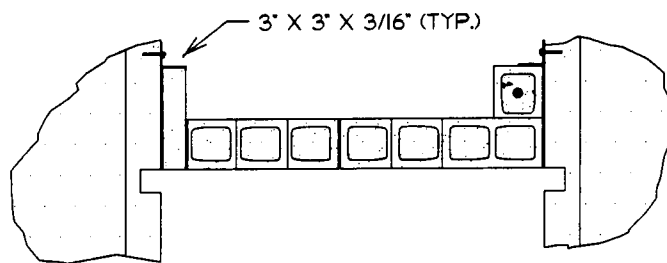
A - CONCRETE BLOCK WALL PLAN
